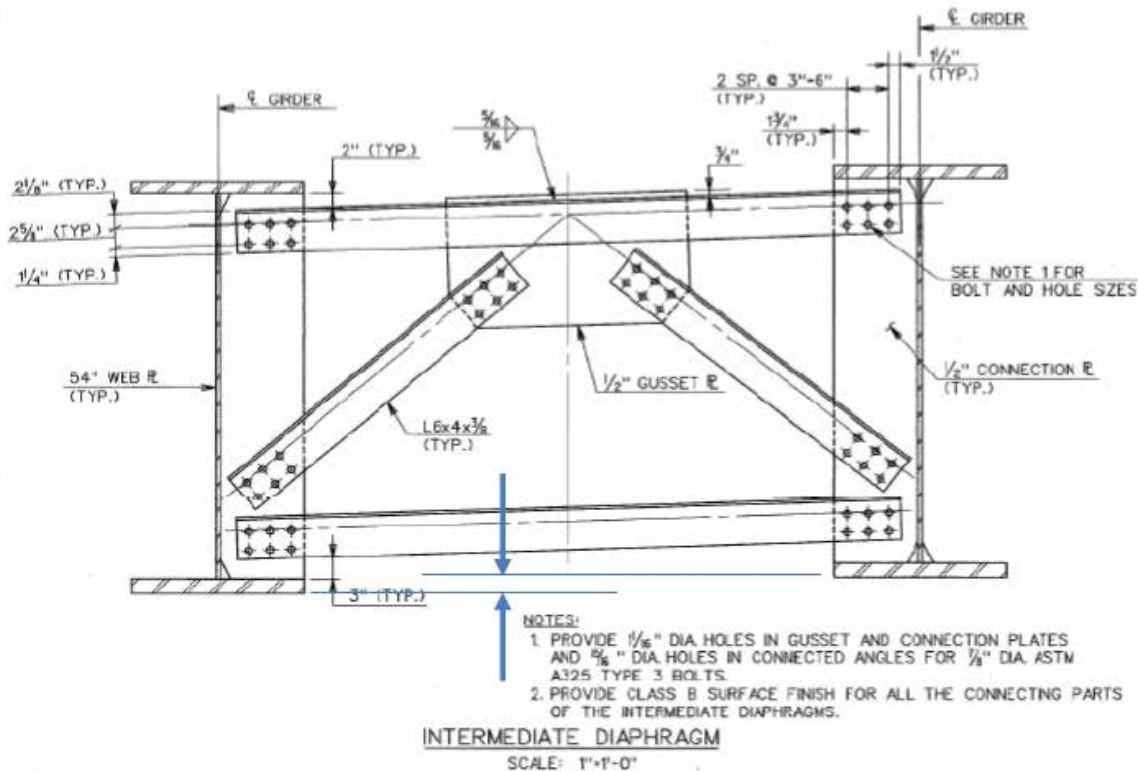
Crossframe Drop on Bridge No. 4 of Route 3 at the Passaic River Crossing
